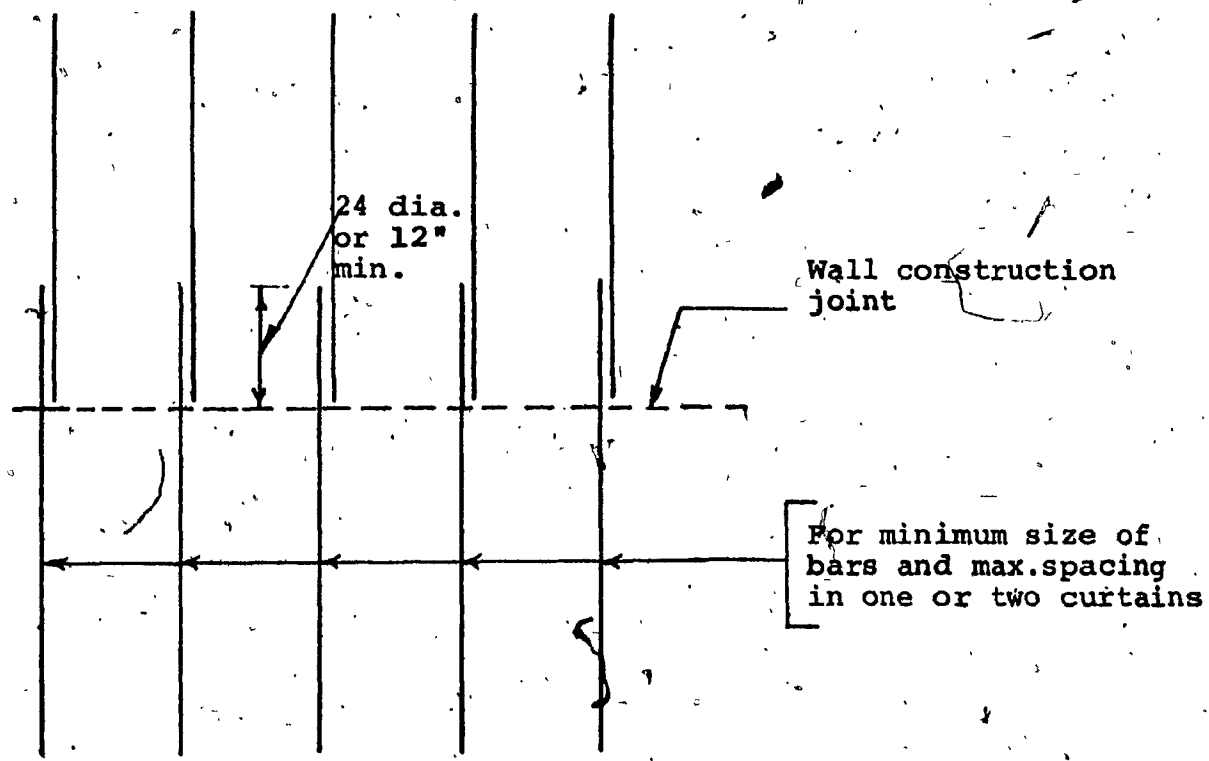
Recommended Reinforcement Detail at Horizontal and Vertical Wall Construction Joints.
